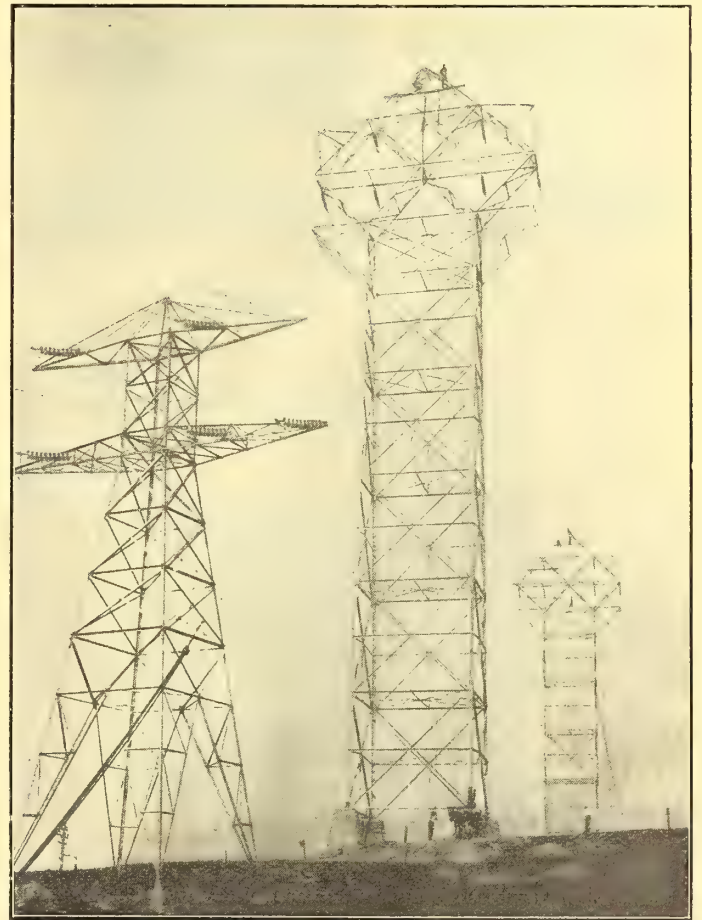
Special Towers over Welland Canal—Strain Tower in the foreground.
